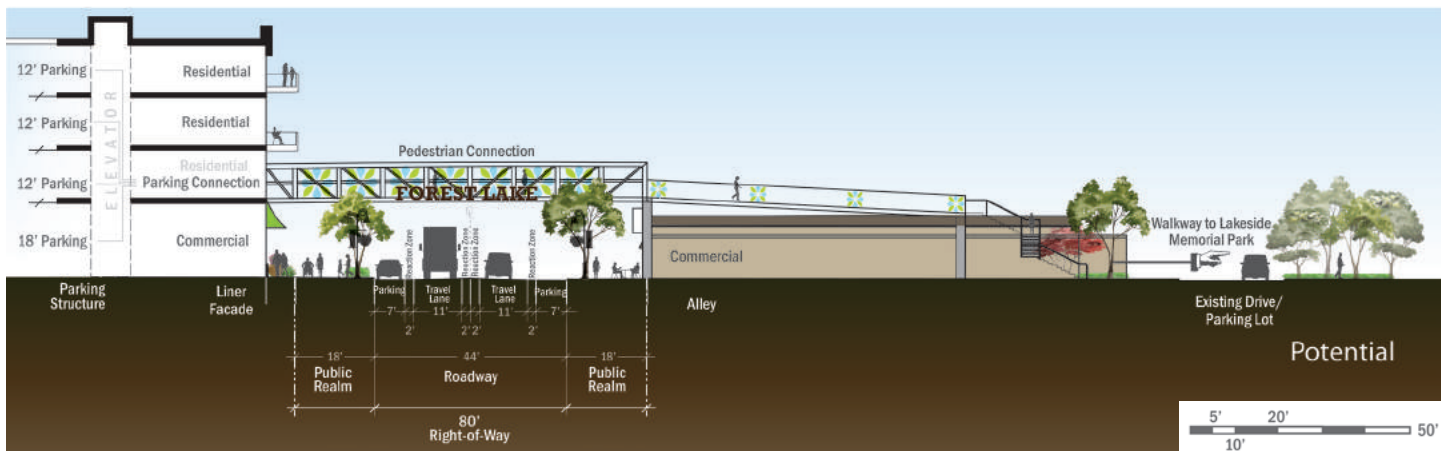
DISTRICT PARKING SECTION, OPTION 1 (SHOWING IMPROVED LAKE STREET STREETScape)
